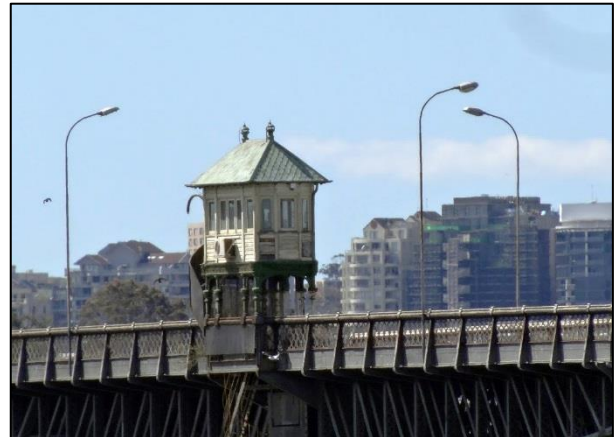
View of Glebe Island Bridge control cabin, facing west-north-west
